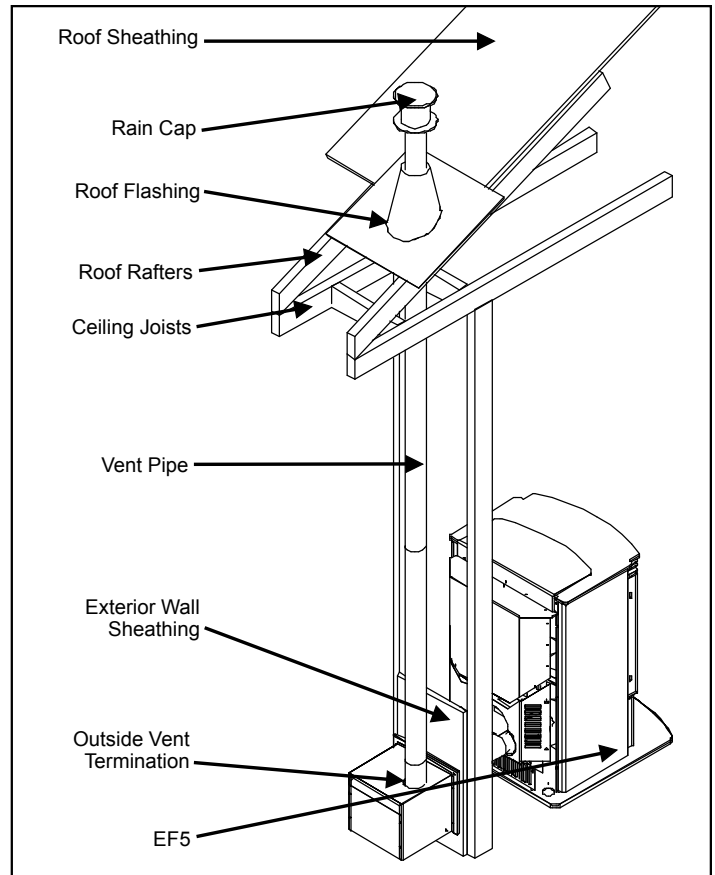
Through Wall Installation with Exterior Blower Kit; Vertical Termination.
